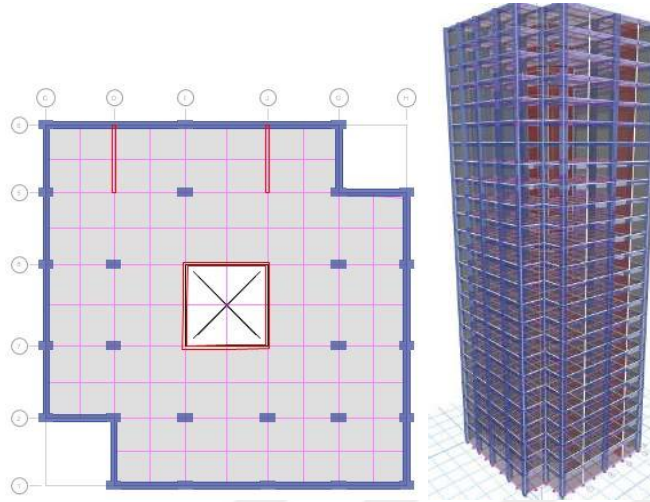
Flat Floor Model Isometric & Plan View Model (6.3-5.5-5.2).
